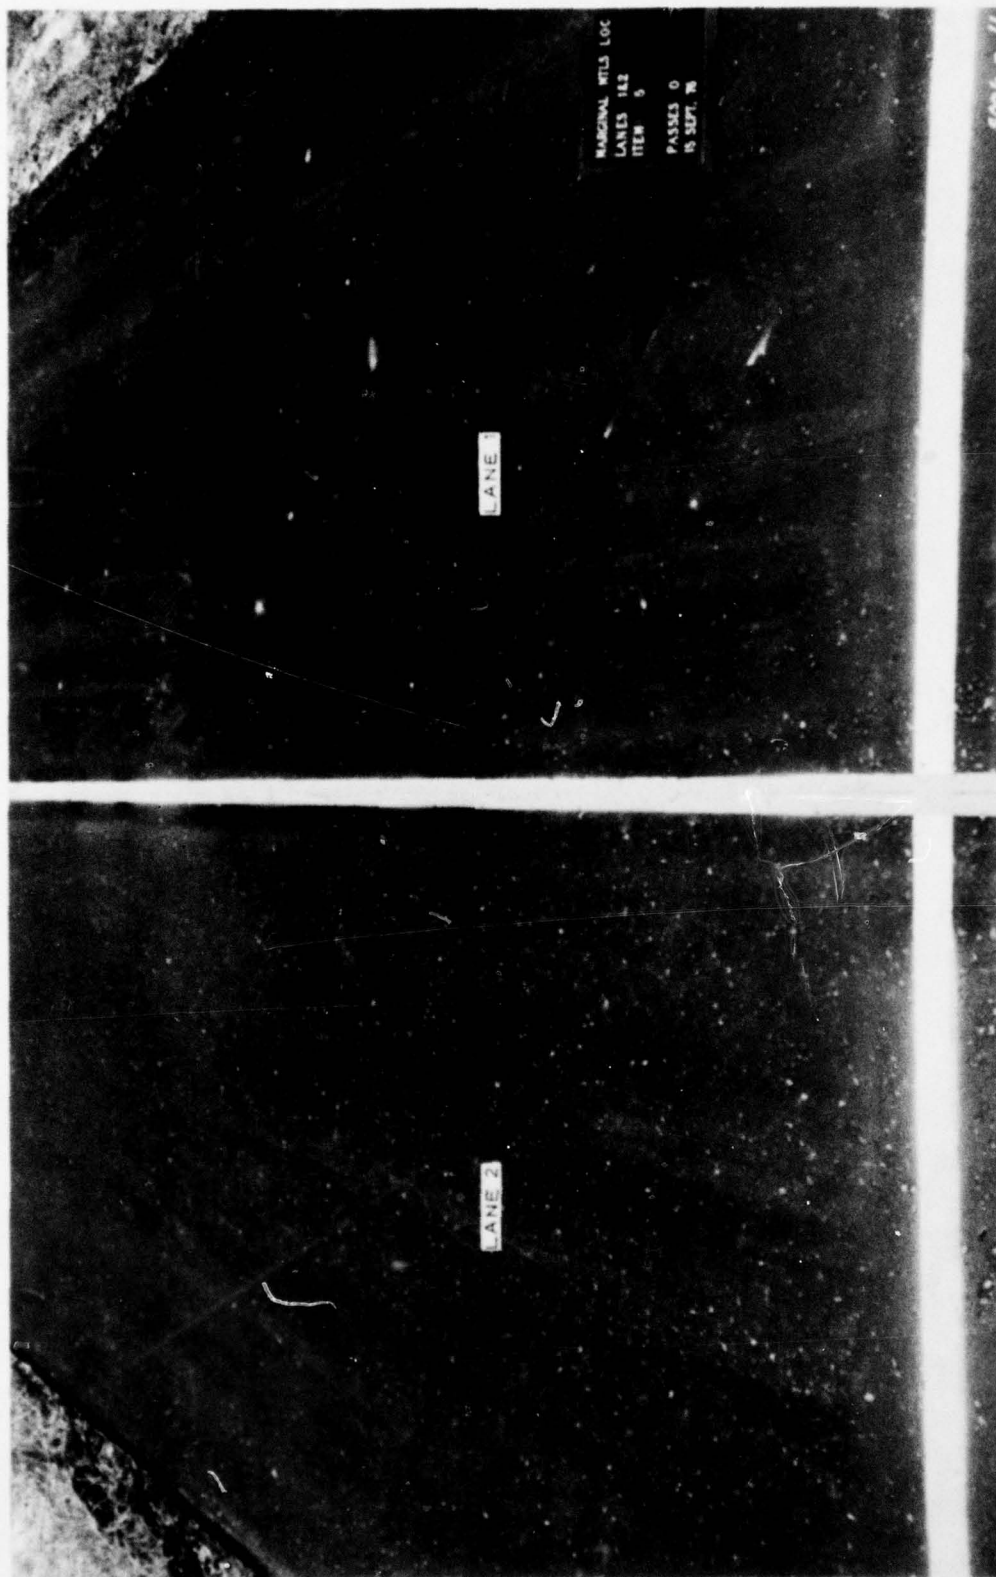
General view of item 5 (flexible pavement) prior to traffic
